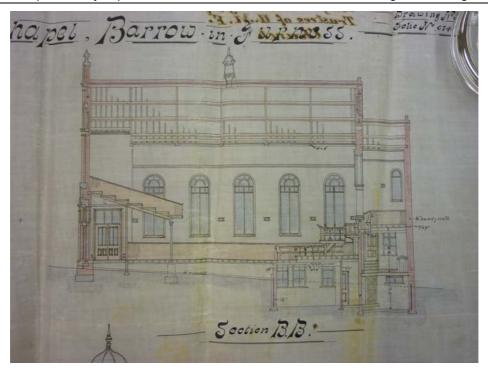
Proposed longitudinal cross-section (CRO(B) Building Control 3237 1894)
